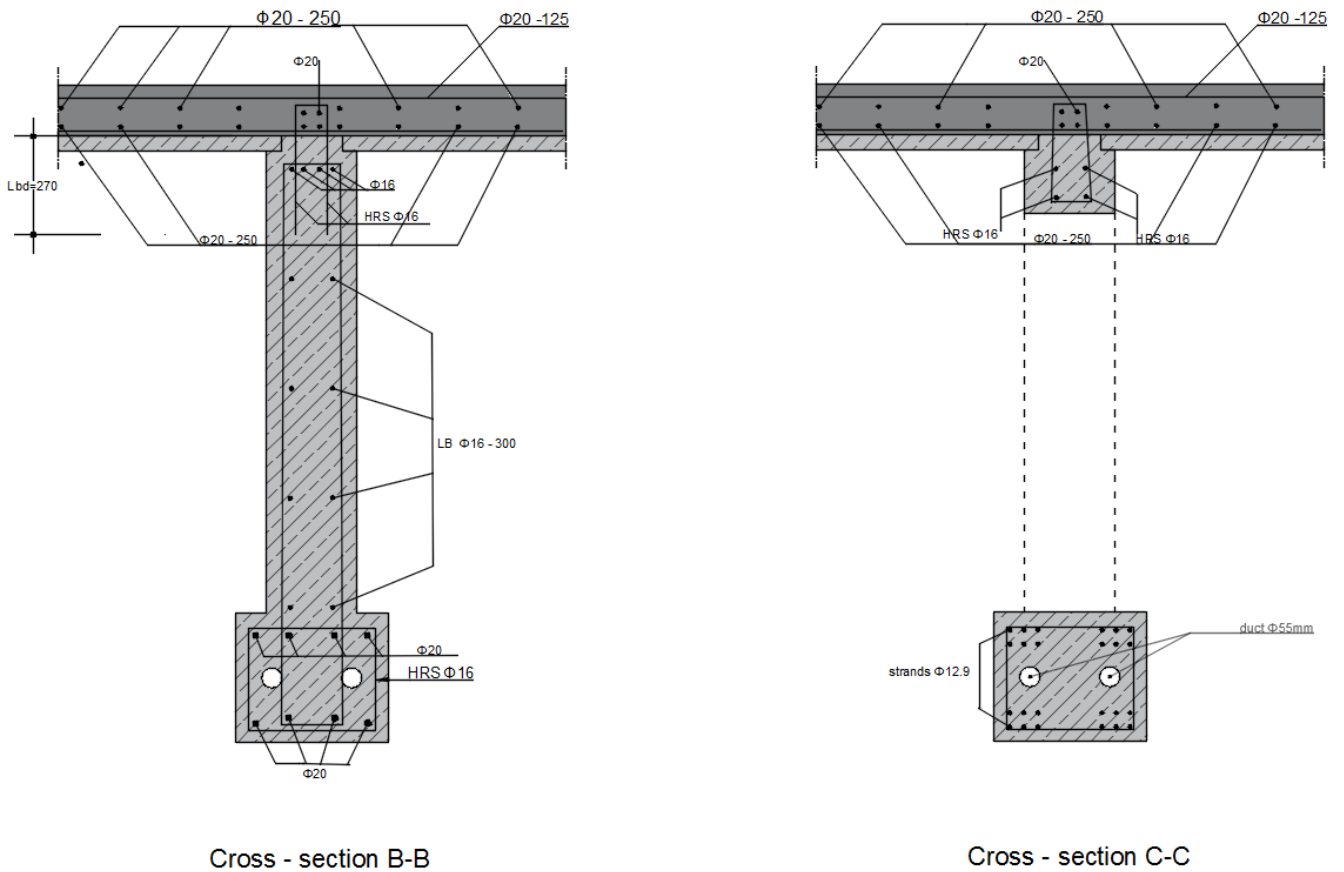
Reinforcement details truss-tie connection and truss-strut connection
